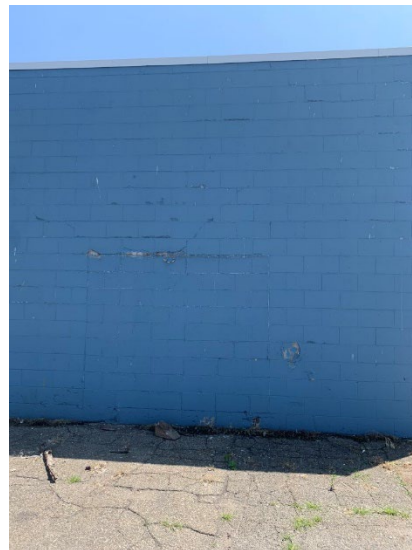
Areas of the CMU wall have failed mortar joints and will need to be tuckpointed. The paint coating has also failed and is peeling.
